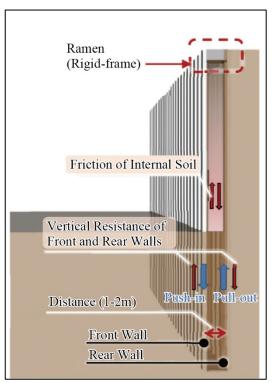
Overview of Retaining System by Double-layered Sheet Piles
